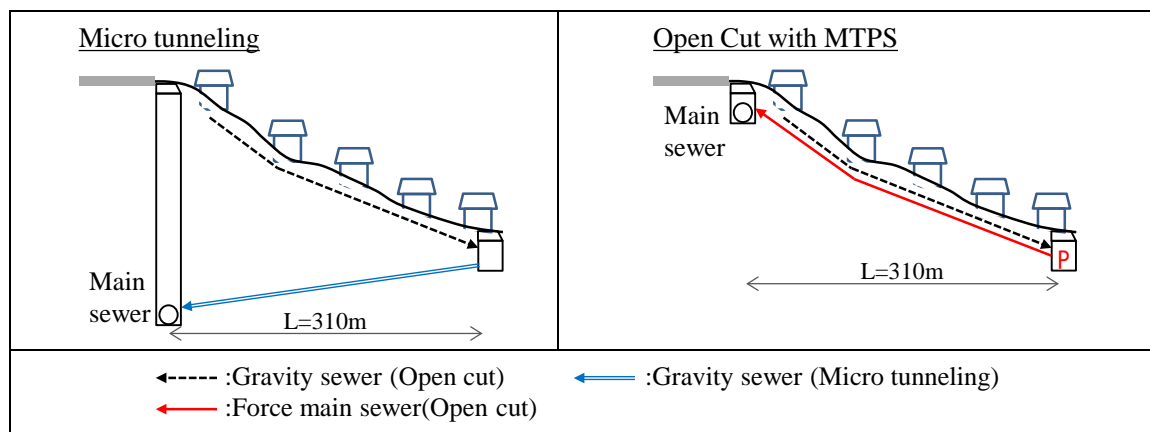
Typical Topographical Feature and Road Configuration
